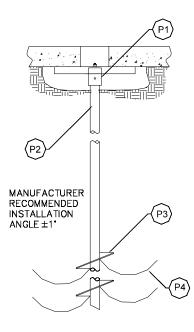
TYPE C SLAB SUPPORT APPLICATION
